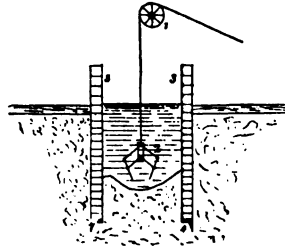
Quicksand sinking with grabber. 1, pulley; 2, grabber; 3, brick walling; 4, cast-iron foot.
